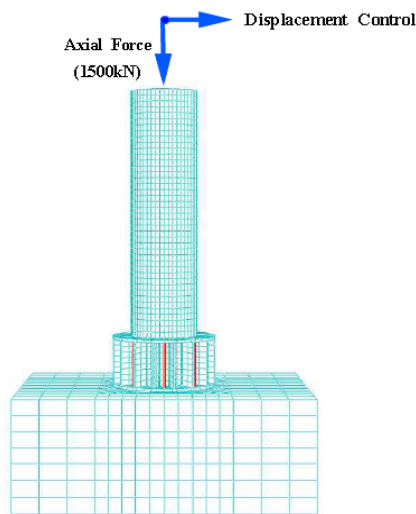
Numerical model of internally reinforced column-to-foundation connection
